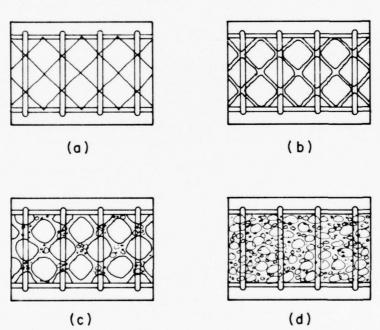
Deterioration of reinforced concrete section in shear with cycling.
